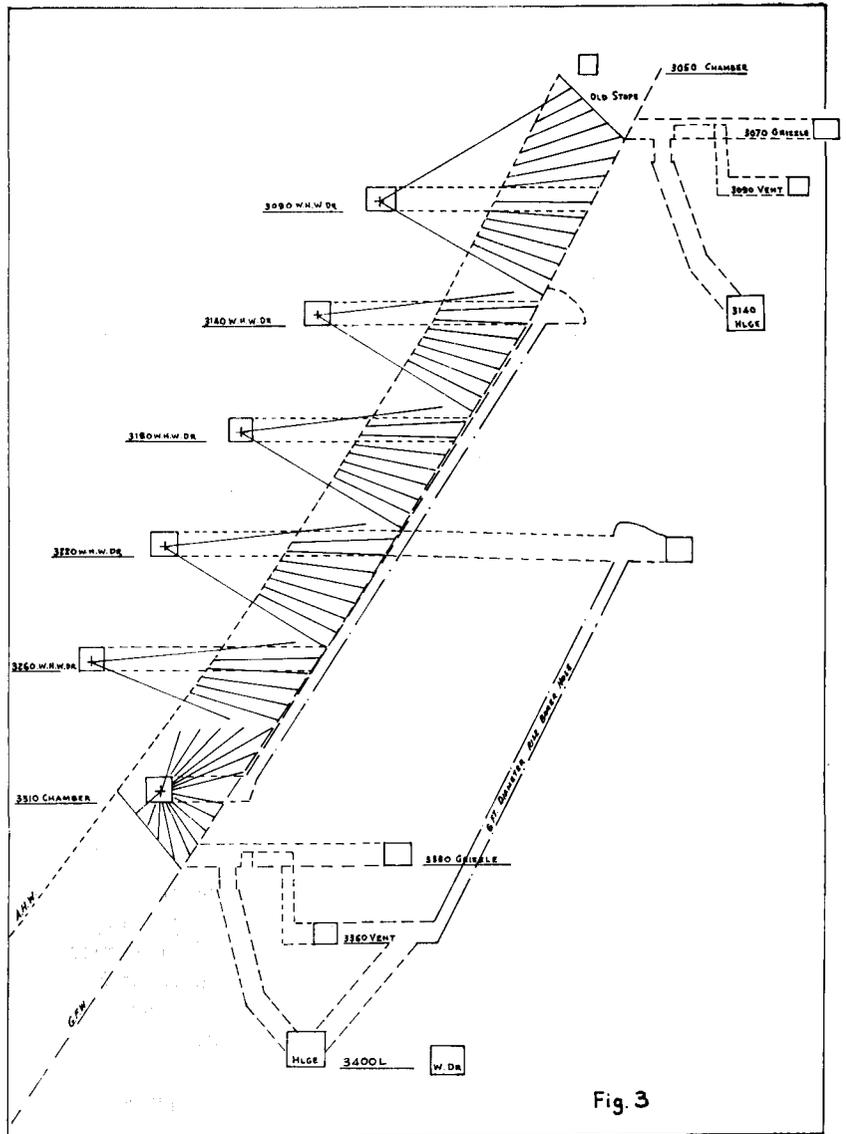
Typical split-back section showing loader drive, Mindola Mine
